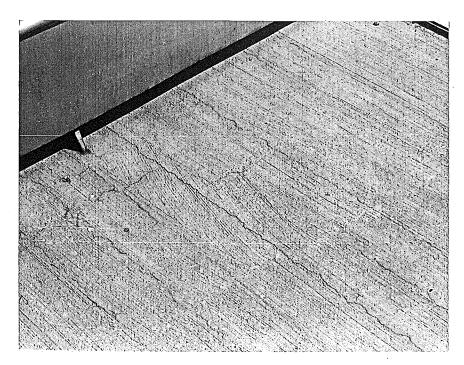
Concrete filled, steel T-grid walk showing typical crack pattern.
